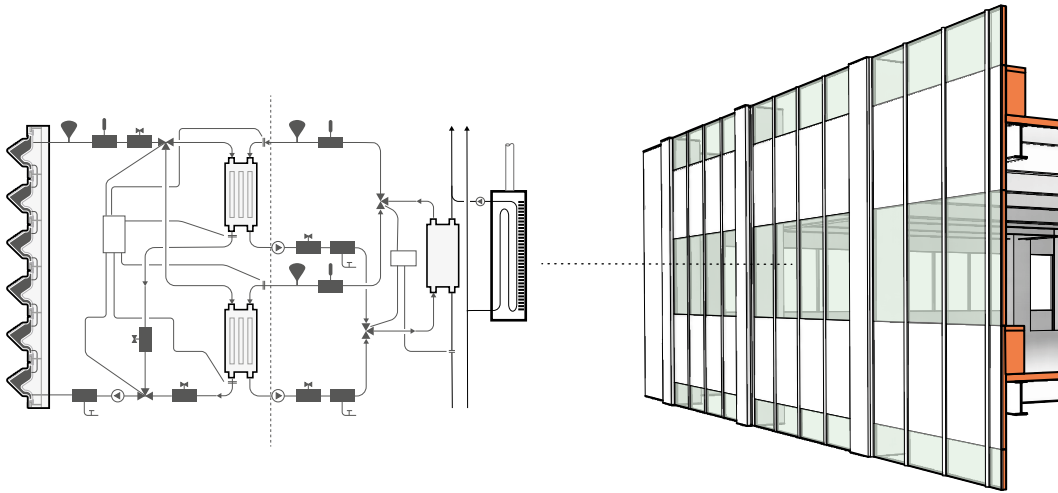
Alignment of existing heating and cooling type with existing façade.
